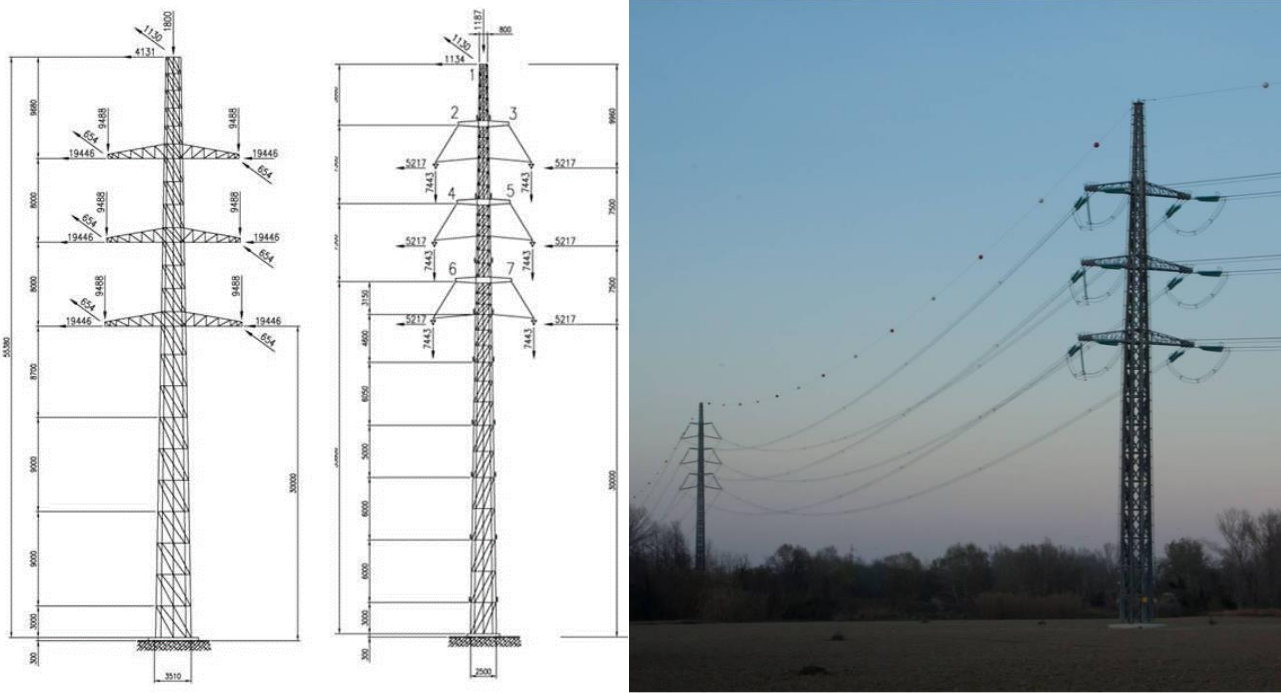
Tension and suspension "Vitruvio" towers [15]
